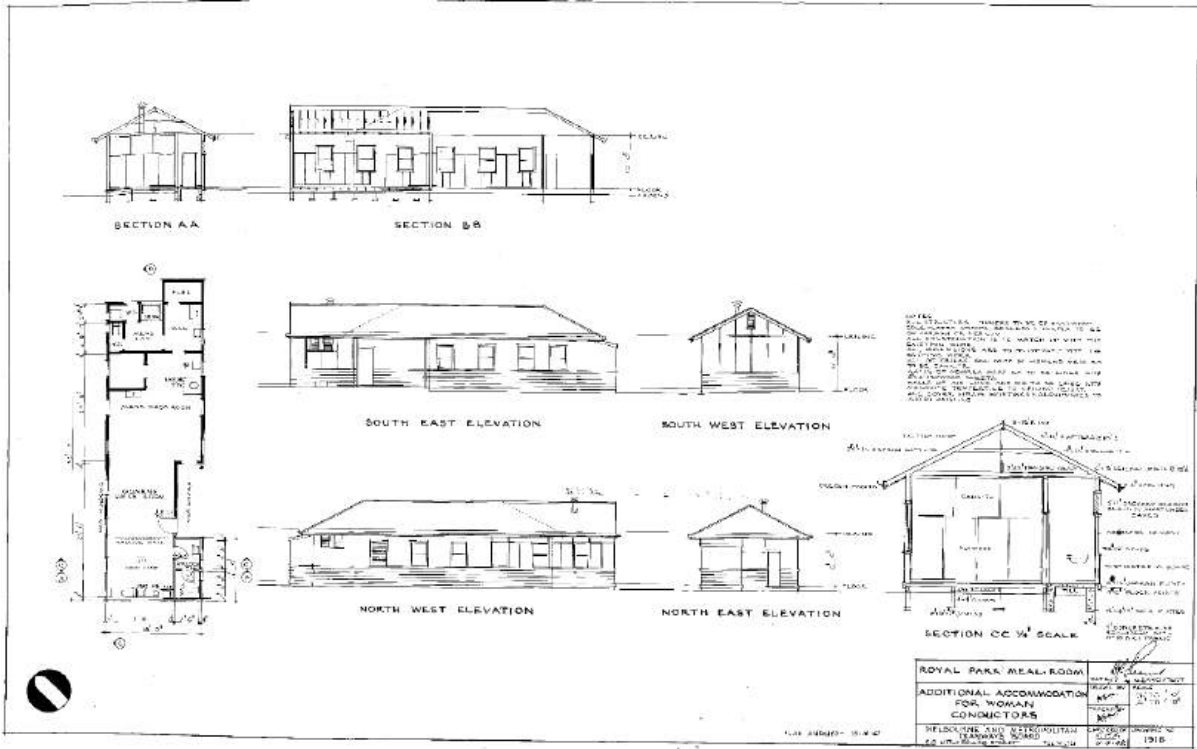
1942 plan for meal room and woman's accommodation upgrades to the Royal Park station buildings (DoTs)
